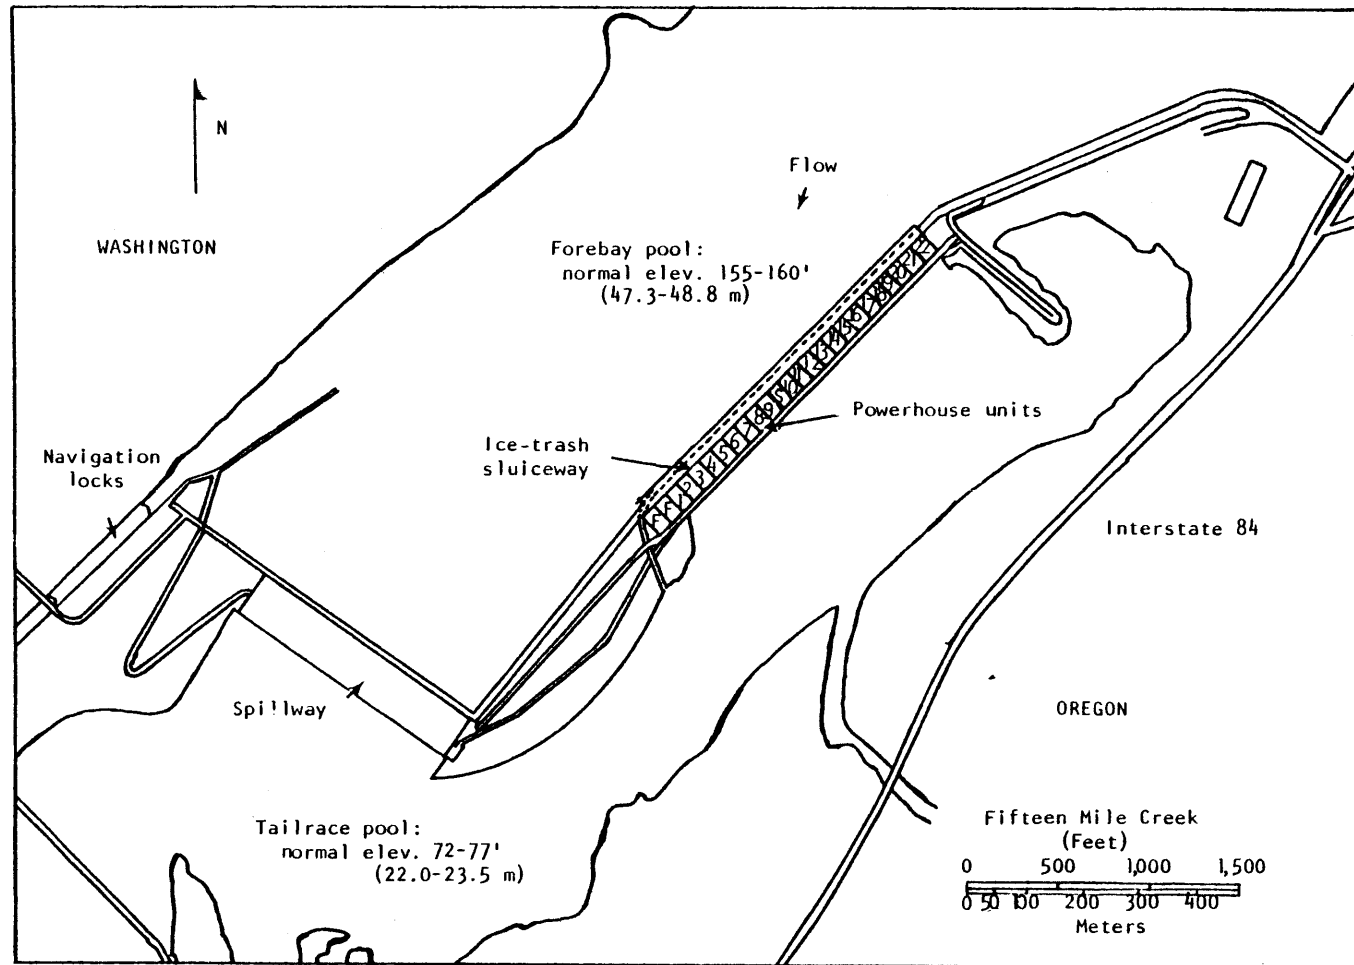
Plan view of The Dalles Dam, Columbia River.
